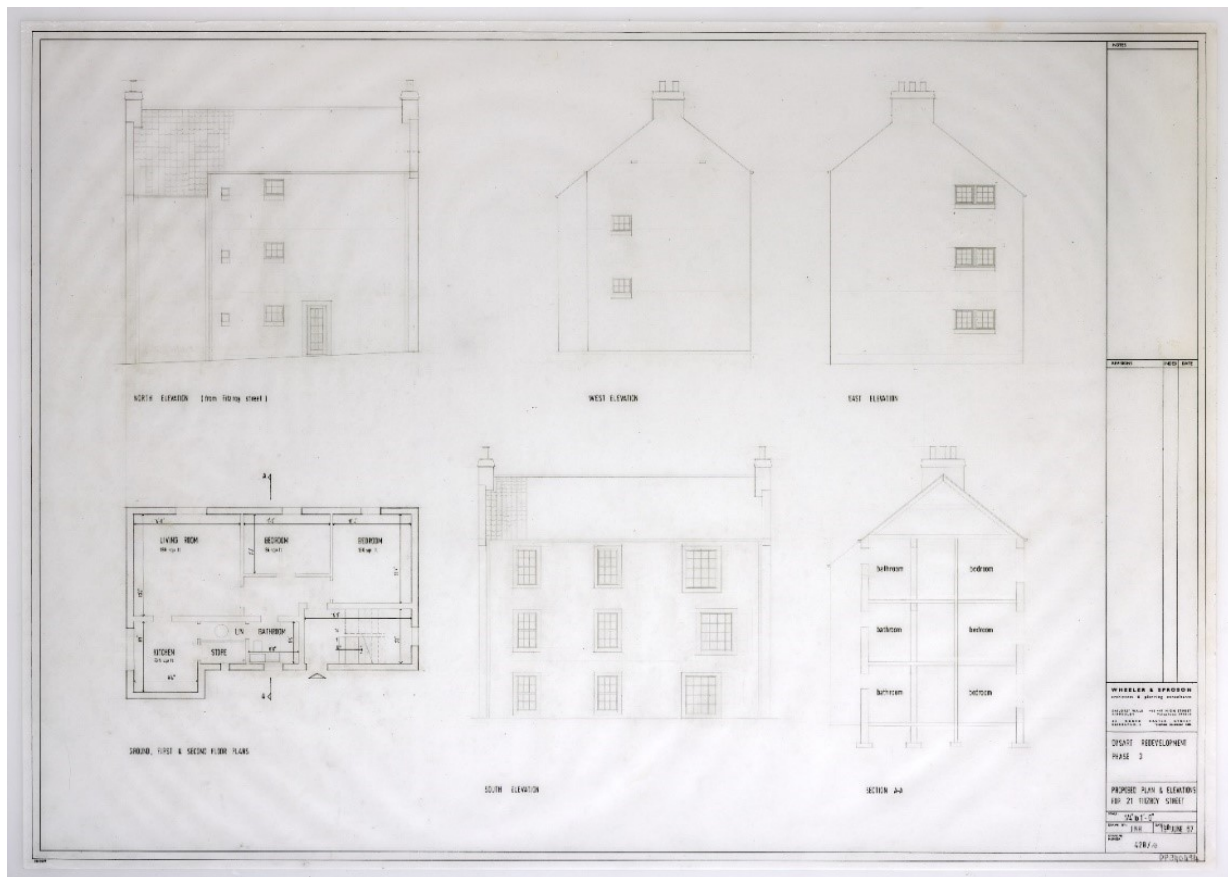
Dysart Phase 3 – Part 1, Block 2, ‘Proposed Plan & Elevations for 21 Fitzroy Street’, 19th of June 1967.
